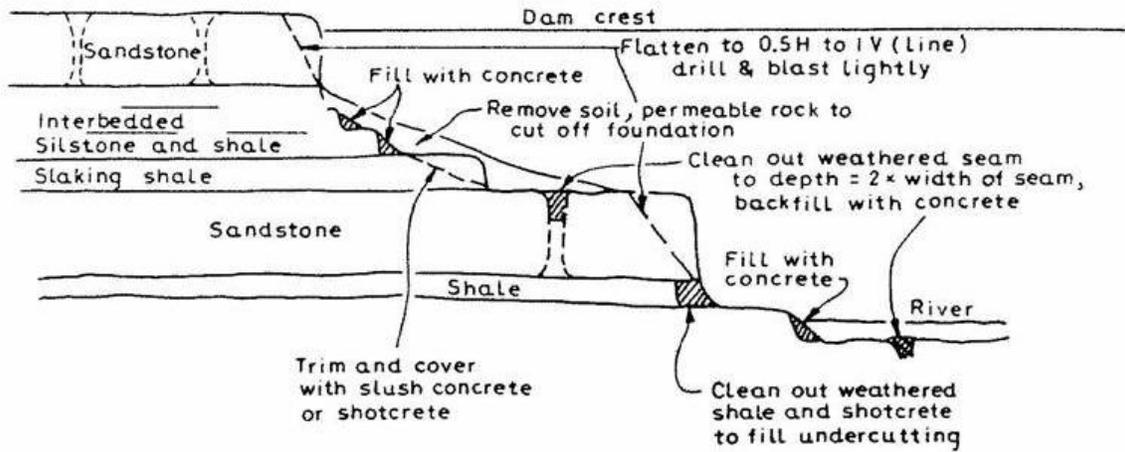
Mica Dam foundation excavation, typical excavation detail (Fell et al., 1992).
